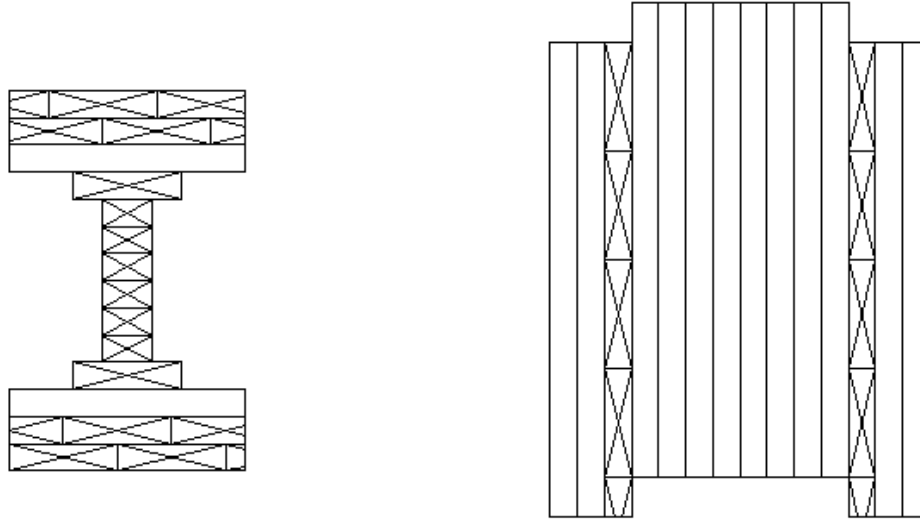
Test #10a – Glue Bond with MF with 2x6 Spreader Board
